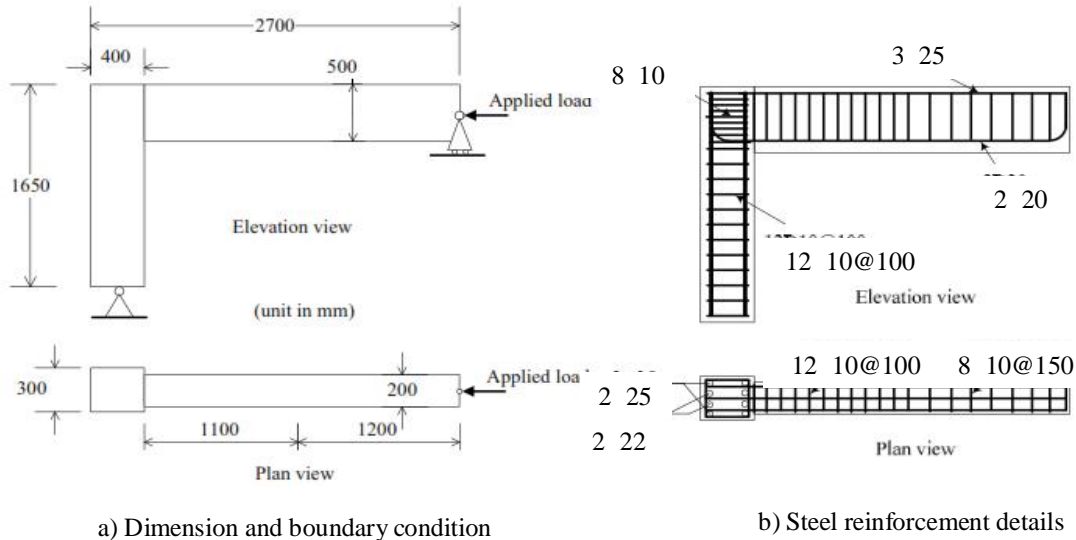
Dimension and steel reinforcement details of knee joint [9] (all dimension in mm).
